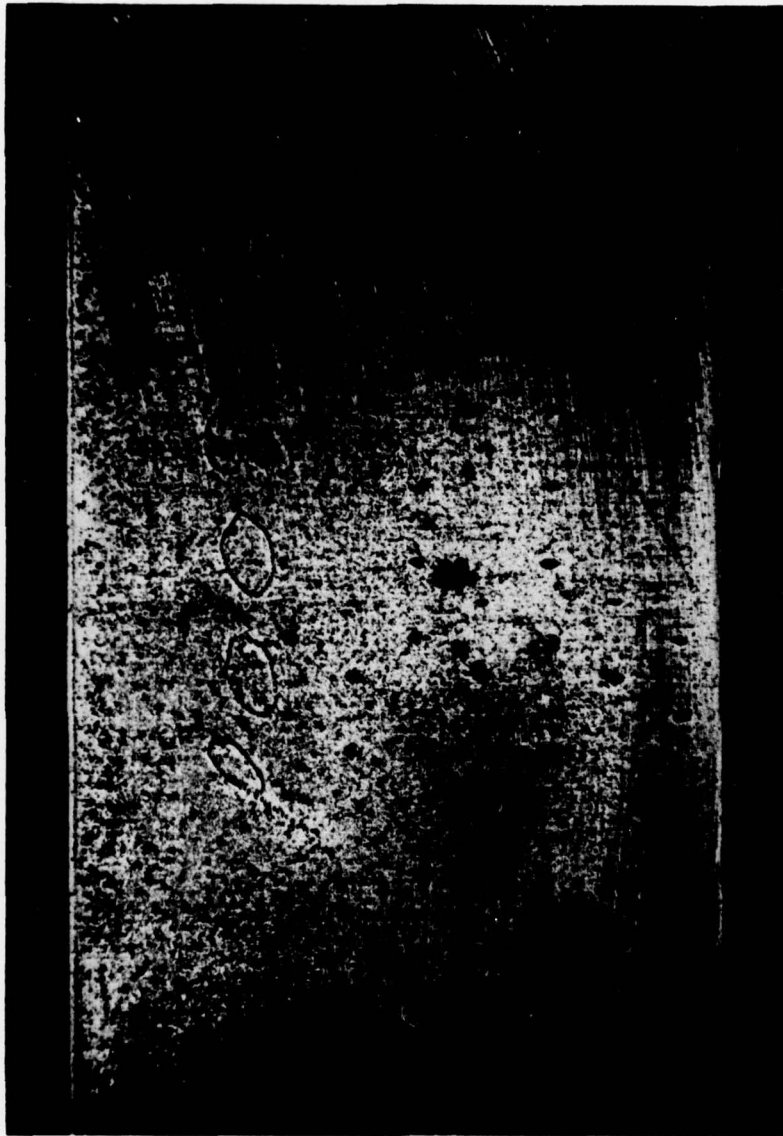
Pitting Corrosion on Unbonded Side of Wedge
